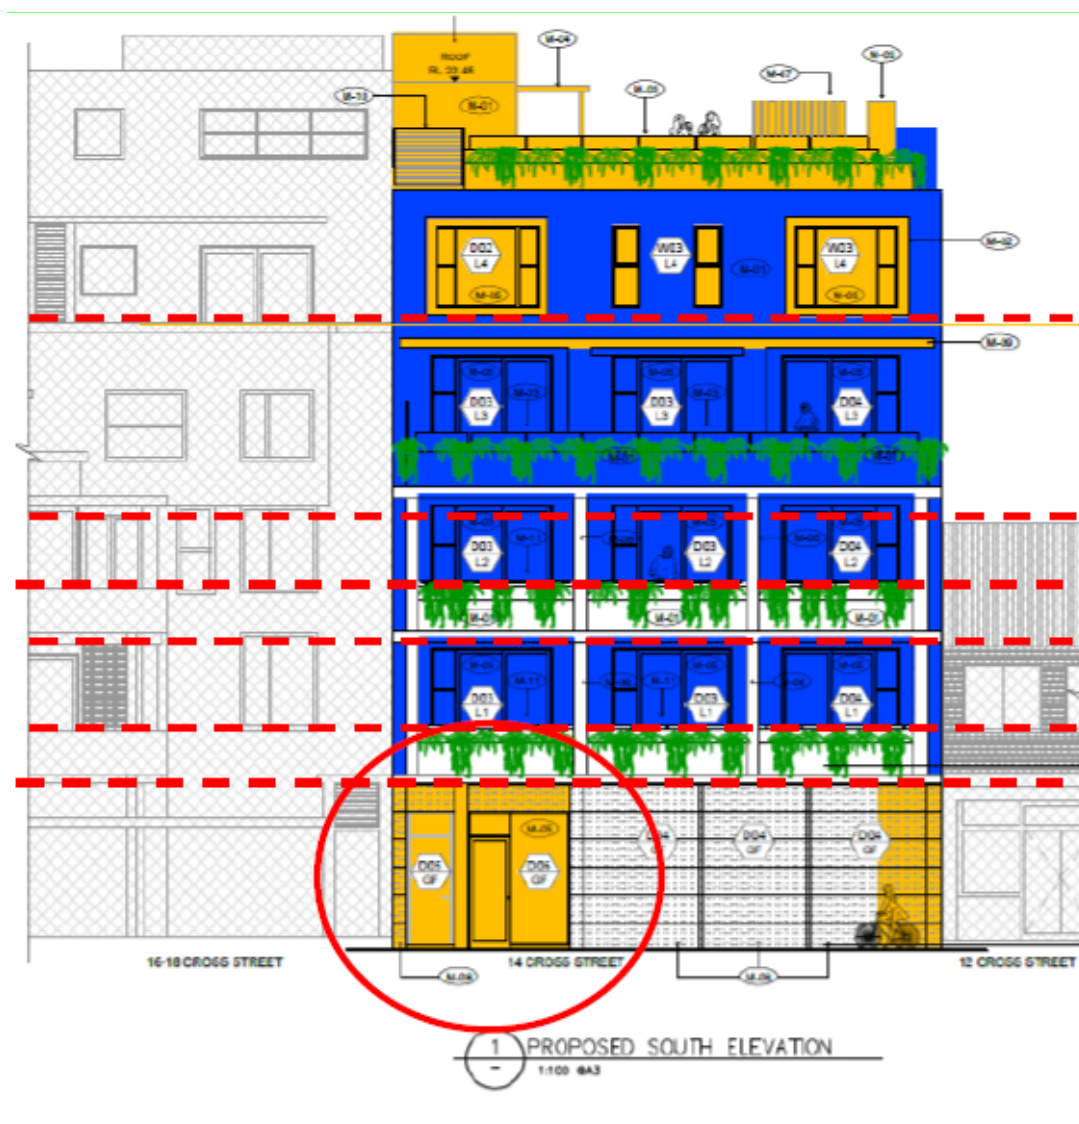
Knox Lane elevation showing retail space (red circle) and alignment of three storey street wall with 16-18 Cross Street red broken line.
